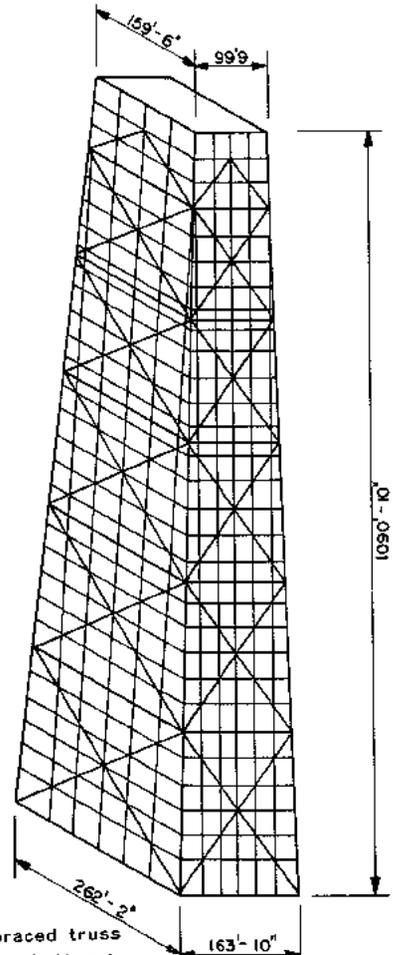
Diagonally braced truss tube structure from bottom to top of building
